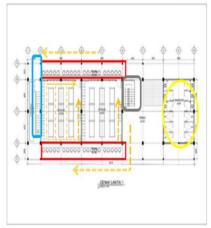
The 1st floor Islamic boarding school building plan for Covid-19 using AutoCAD
